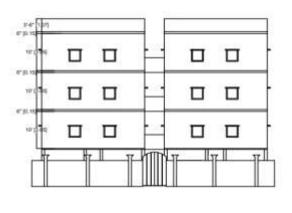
2D Plan In Autocad Table-1: Detailed Estimation of building
